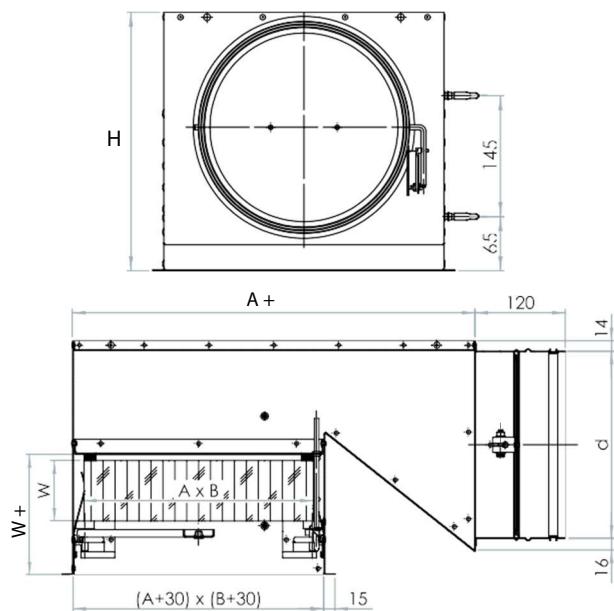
Dimensions of the box with the side connection pipe and Pb damper adjusted on the connection pipe.
